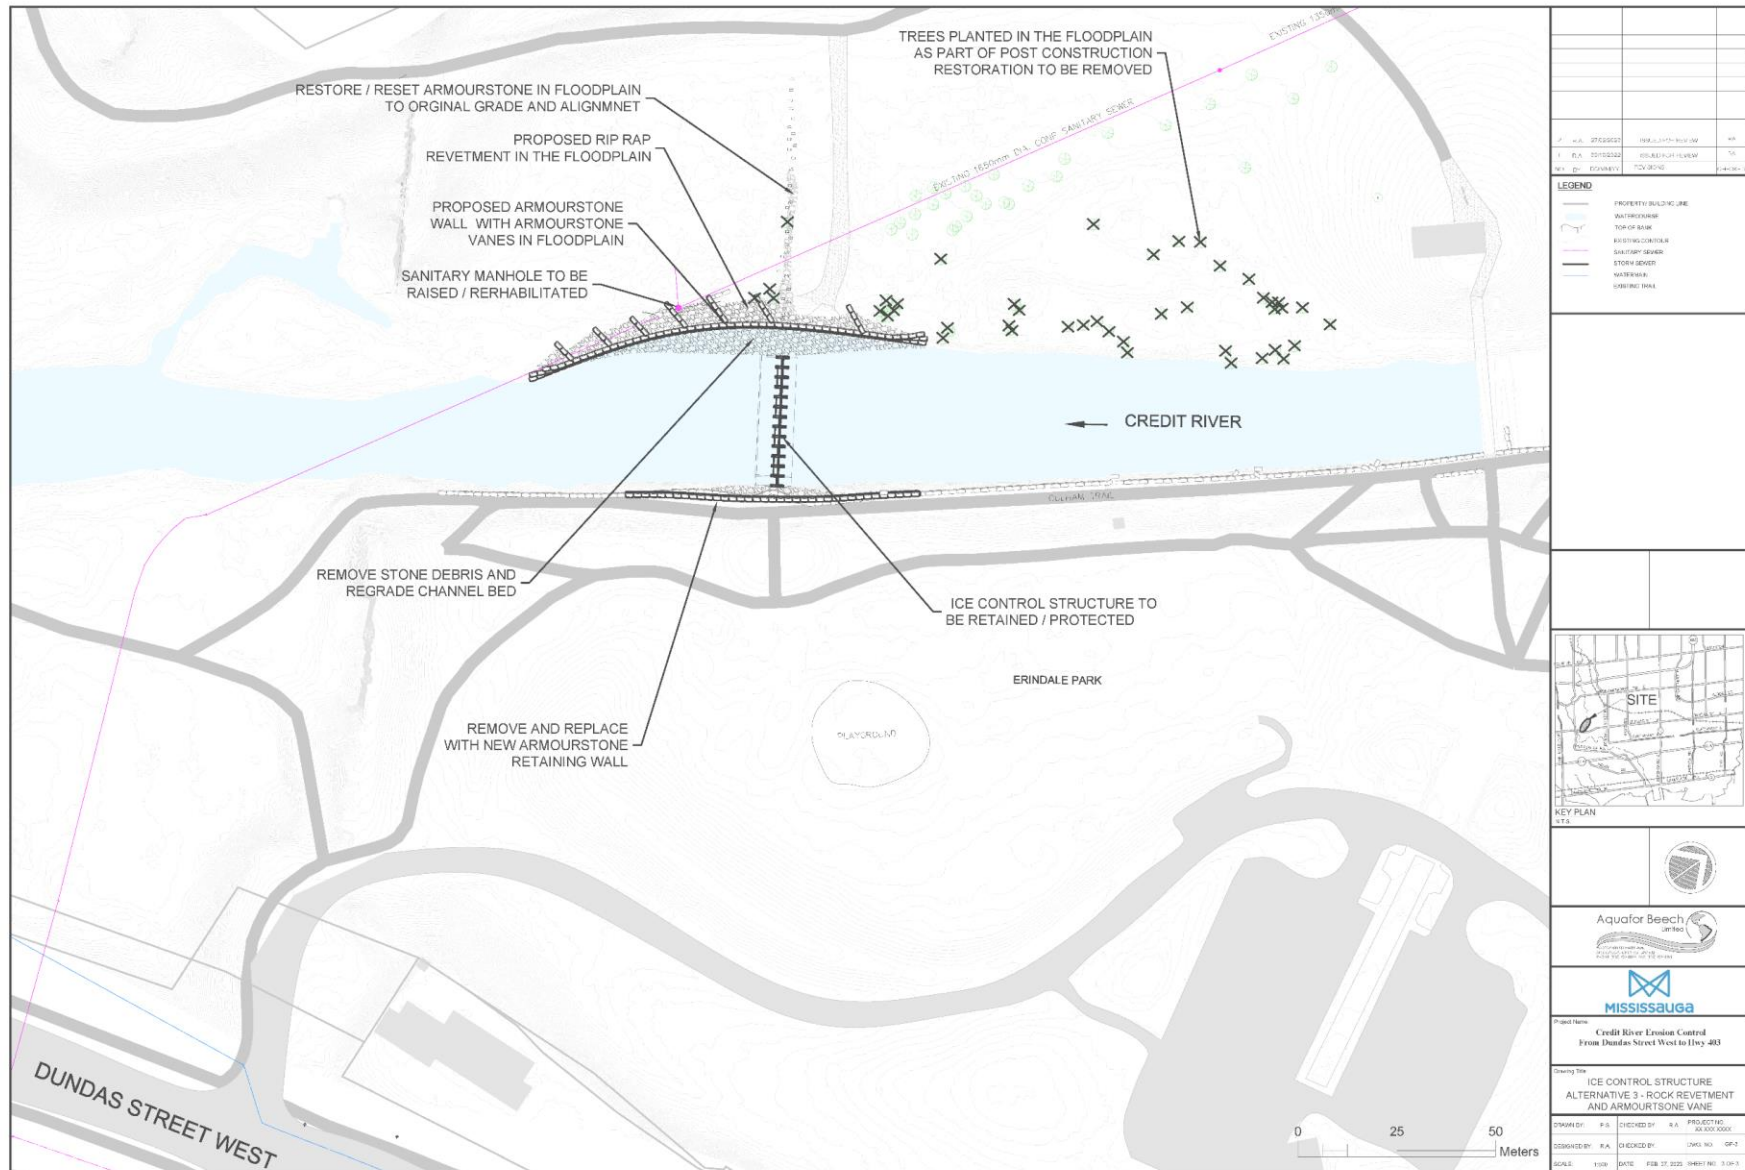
Preliminary Design for the Preferred Alternative – Site #1
